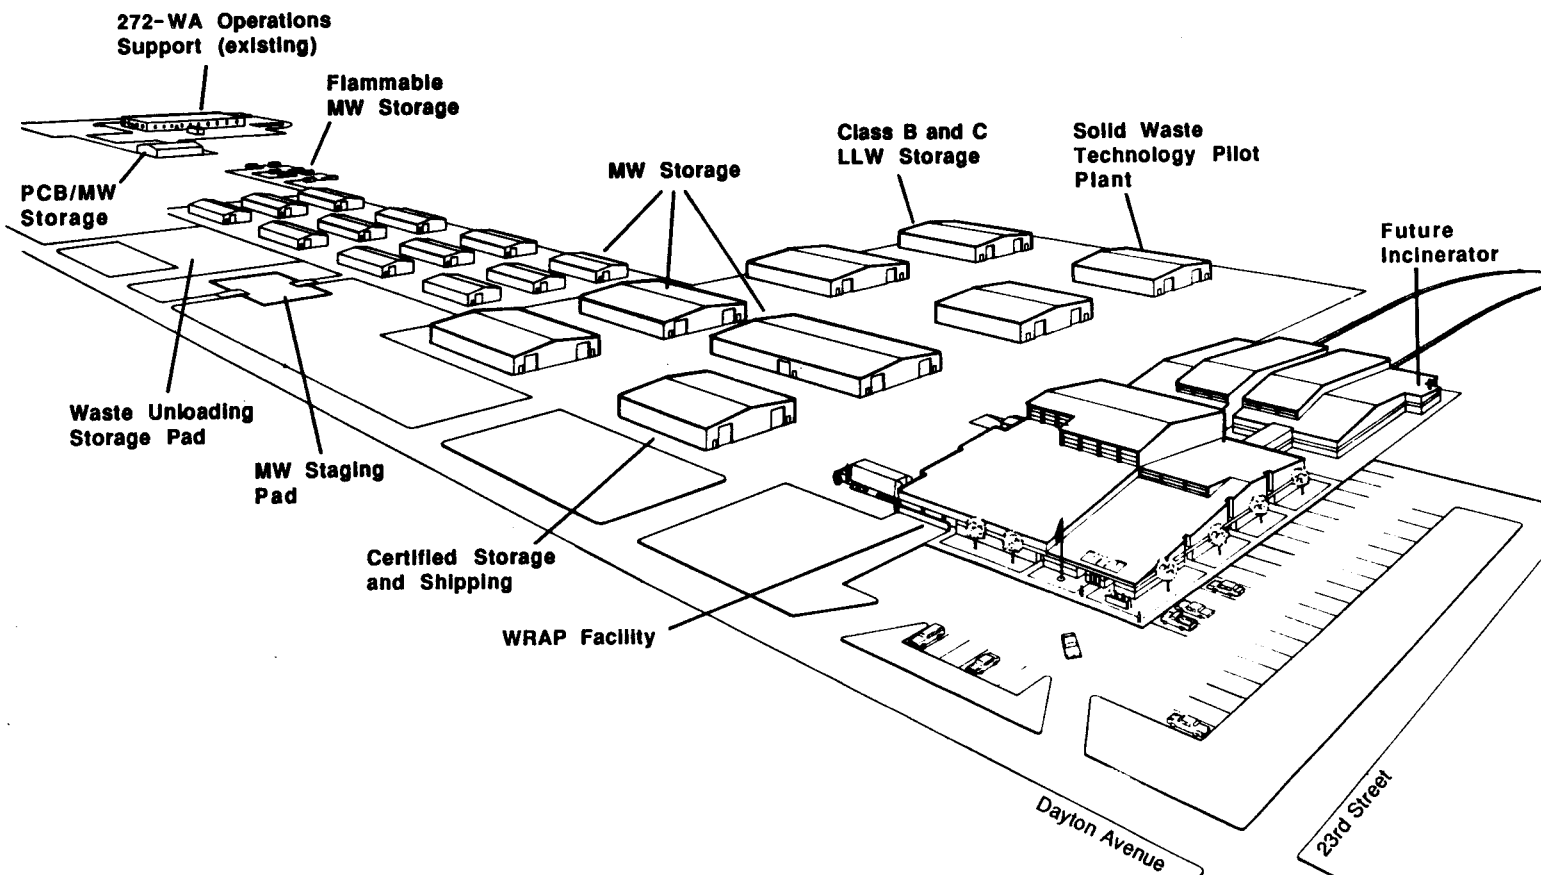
Artist's Conception of Proposed Hanford Central Waste Complex.
